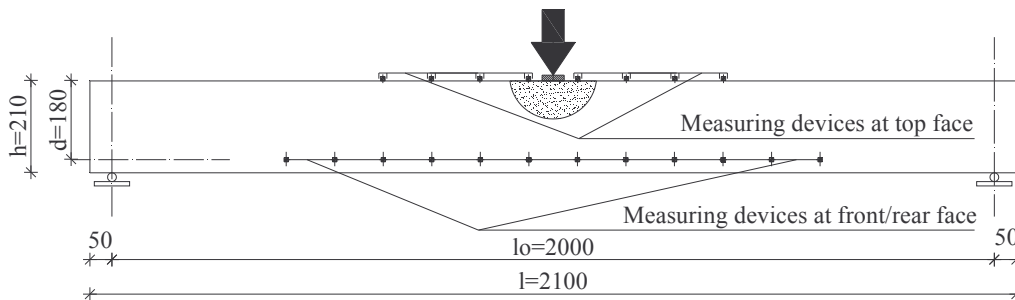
Tensometers arrangement on elements B1 ÷ B4
